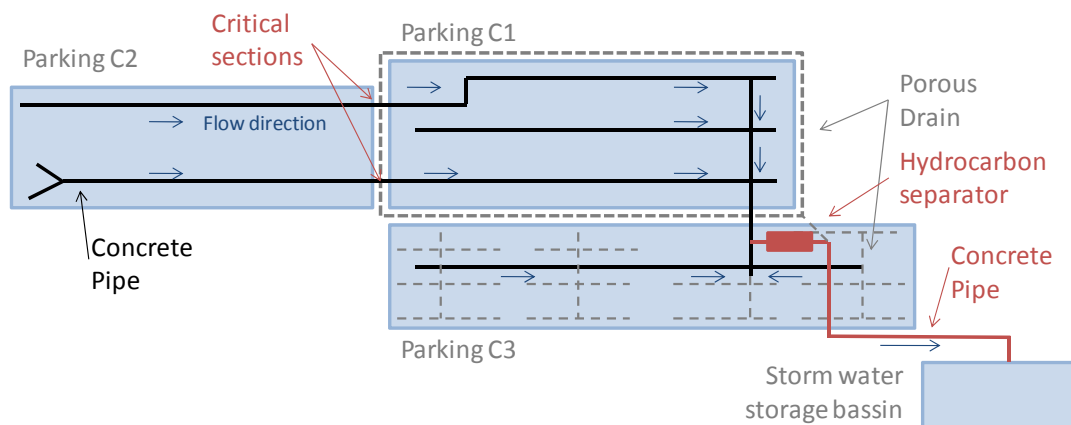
The storm water drainage system includes porous drains and concrete pipes
